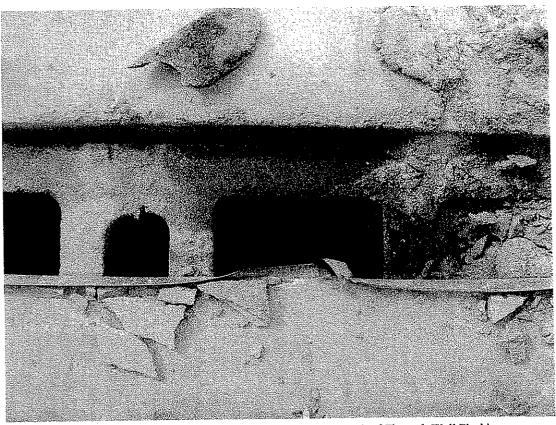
Moisture Present in Wall Below Coping Stone—Note Lack of Through Wall Flashing
